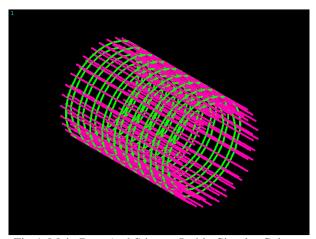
Main Bars And Stirrups Inside Circular Culvert
